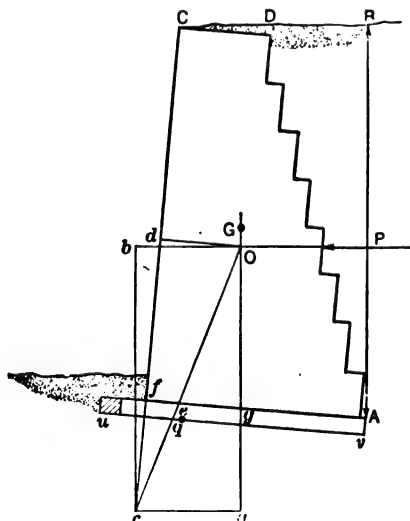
EQUILIBRIUM OF RETAINING WALL.
